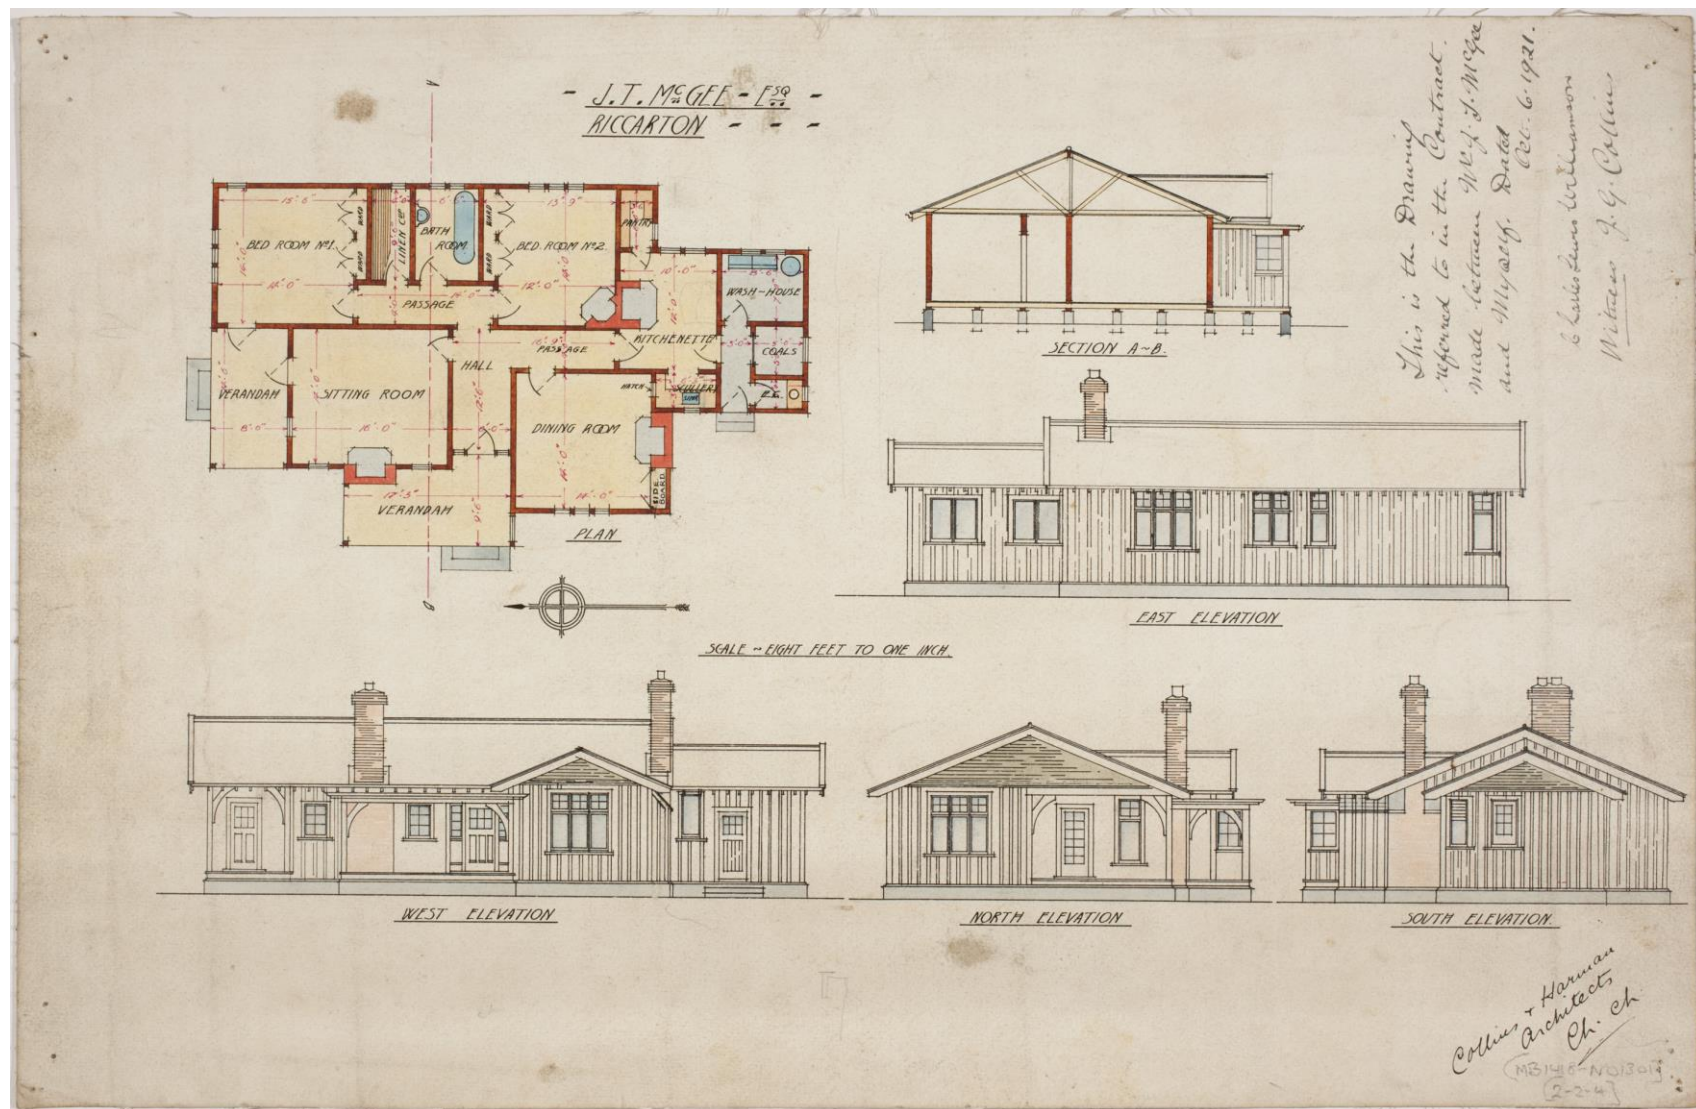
Collins and Harman, J. T. McGee, Esq., Riccarton, plan, elevations and section (1921).
